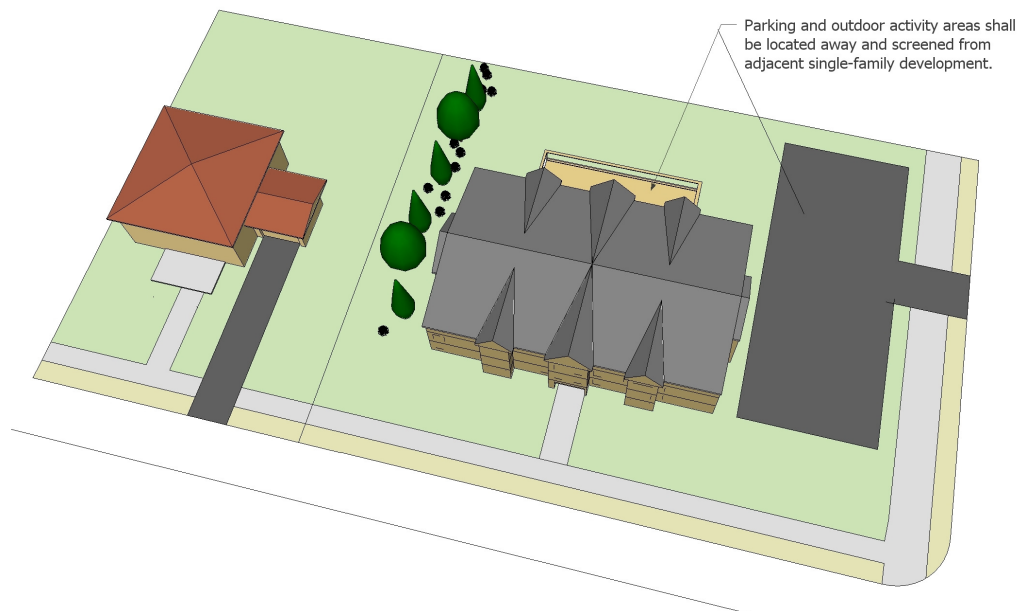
(D)(10): Location and Screening of Multifamily Parking and Outdoor Activity Areas
